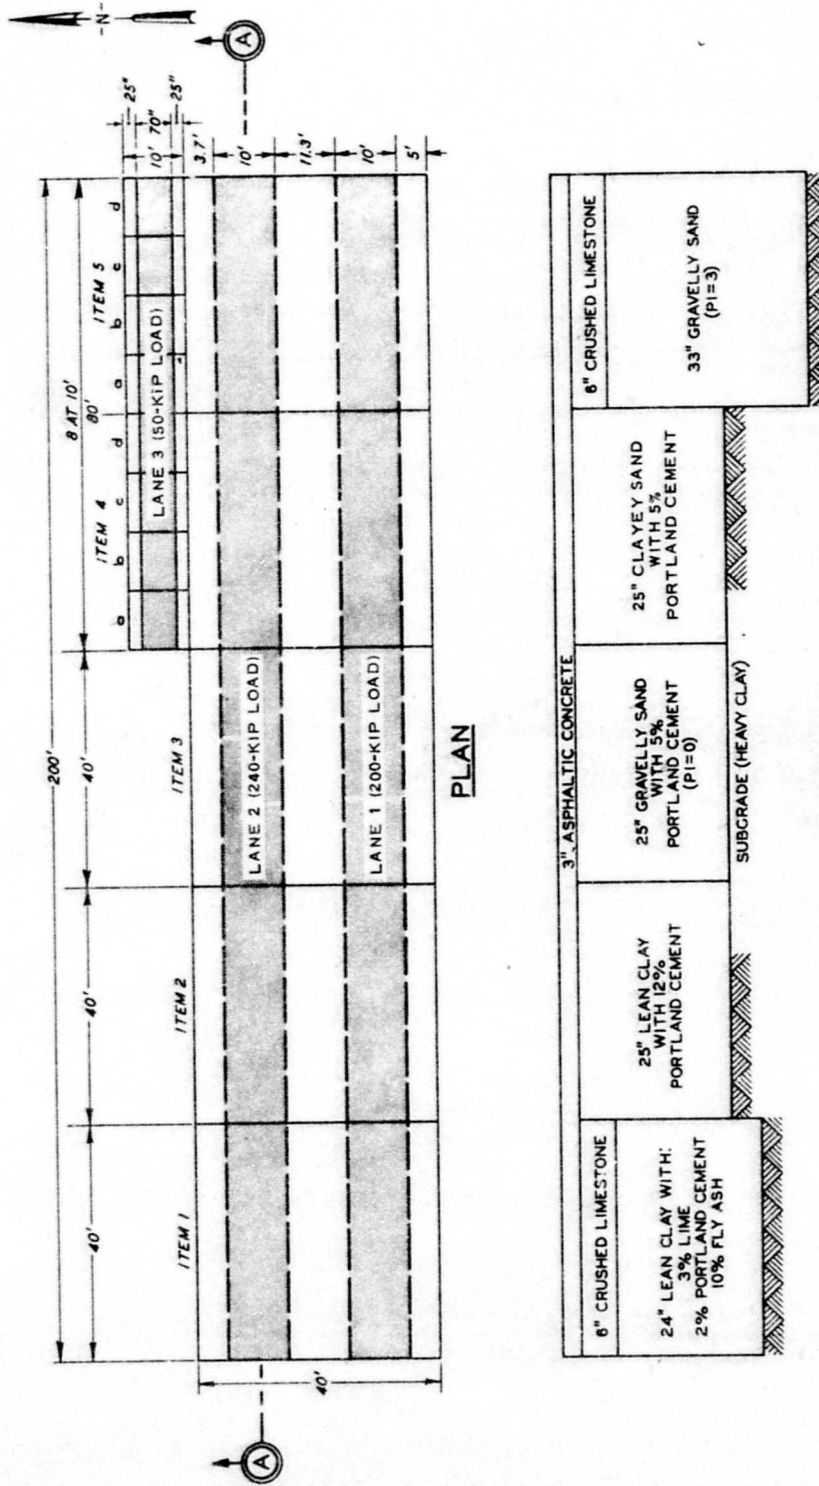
Layout of structural layers flexible pavement test section (after Burns et al. 39)
